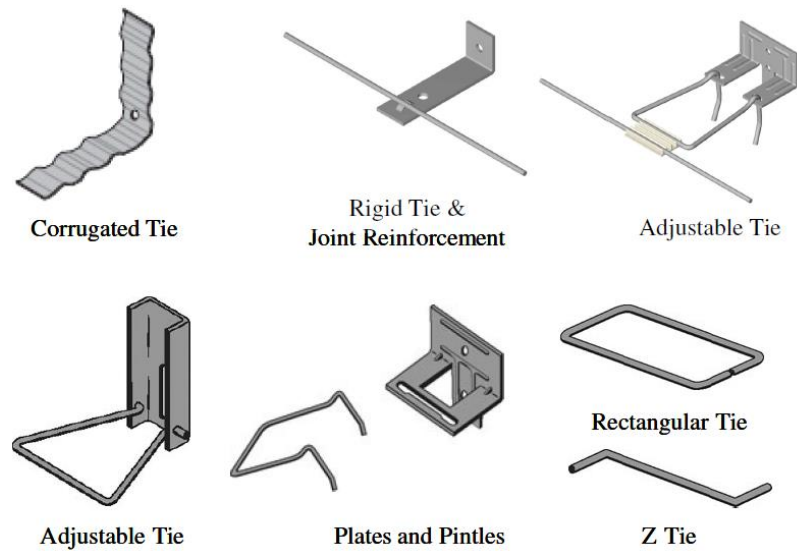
Examples of ties for masonry veneer walls with steel stud and wood frame backup [16]
